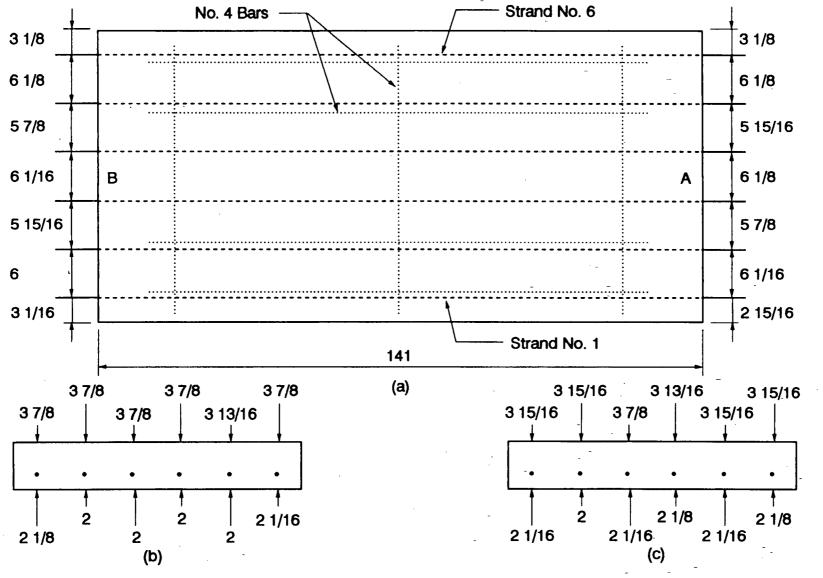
Specimen No. 16-6.0DU-1 (dimensions shown in inches):
